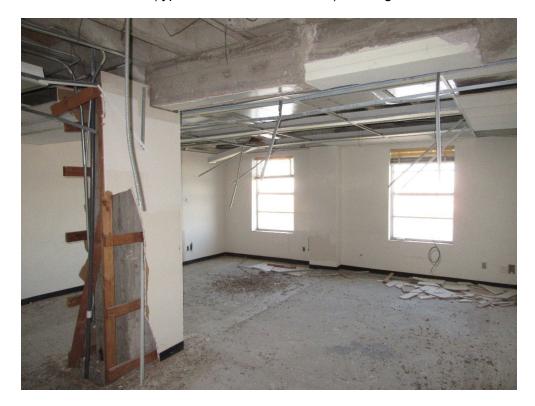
Seventh floor, office area (typical on the 6th-12th floors), looking west.
